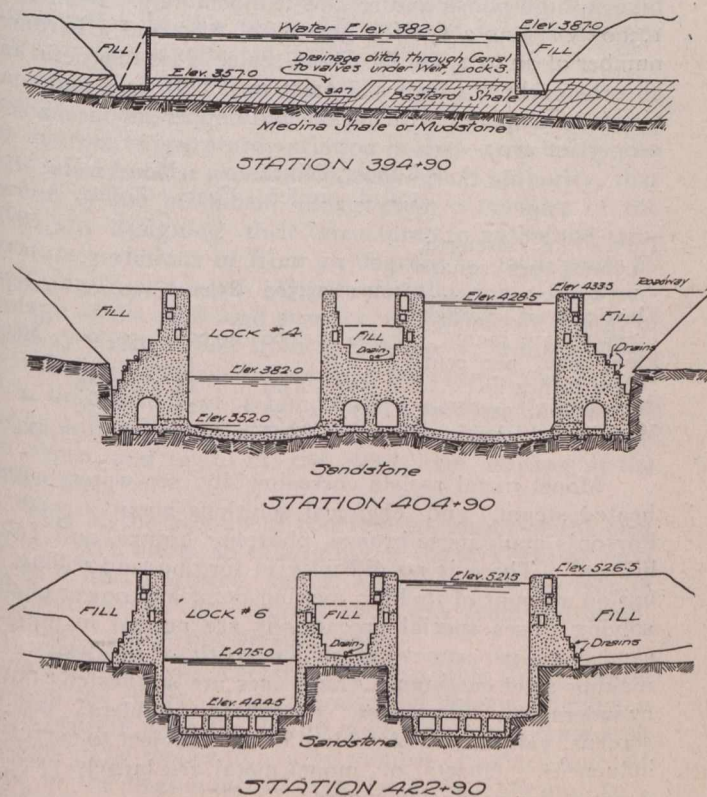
Typical Cross-Section of Earth-Works at Various Points.
